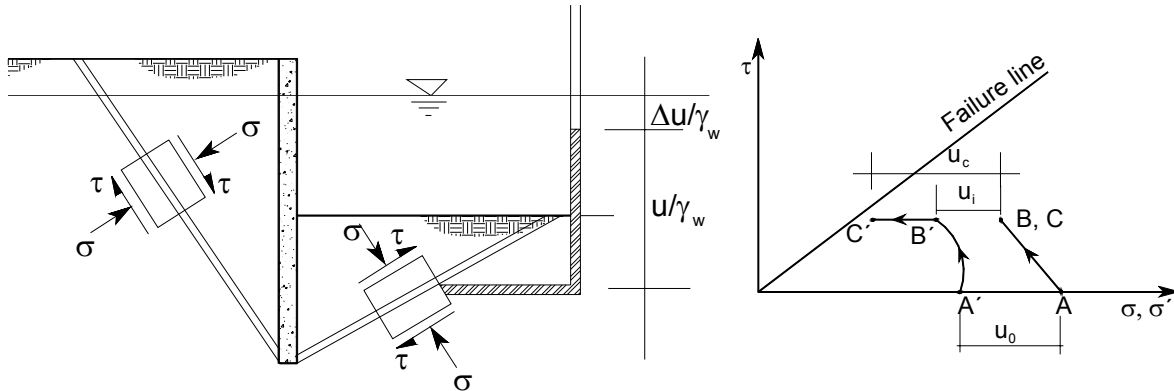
Change of stress and pore pressure for a wall retaining excavation
